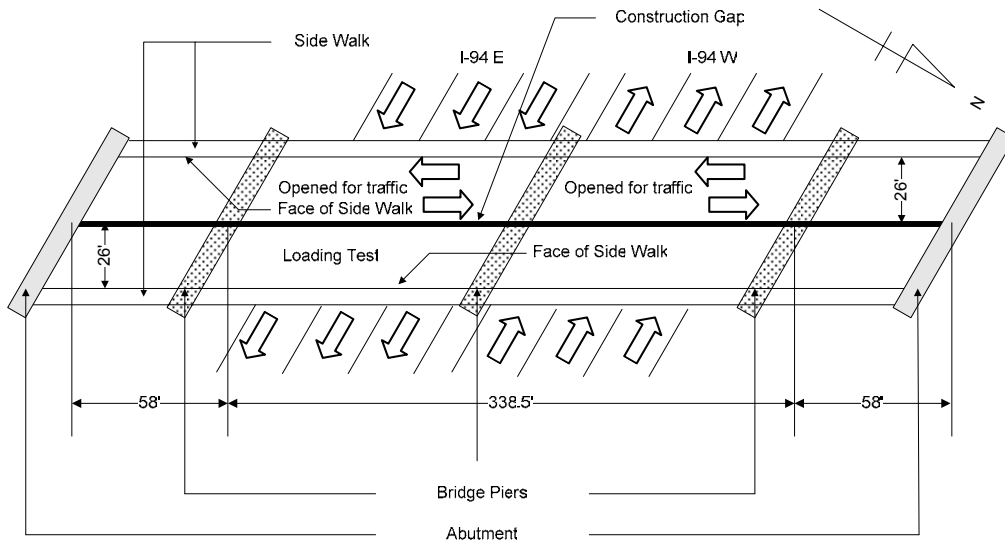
Plan view of bridge span loaded on September 19, 2005
